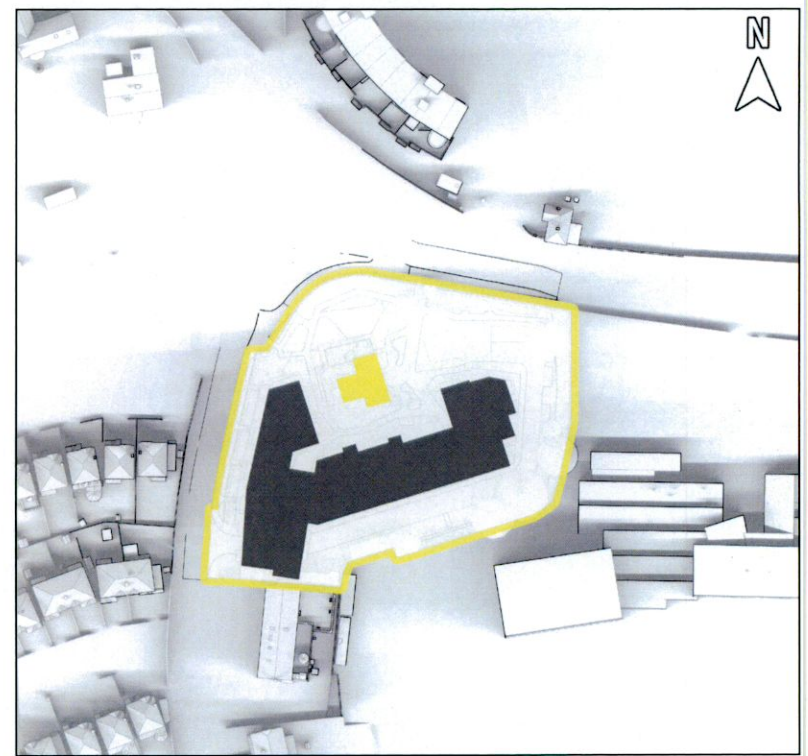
Floor plan of assessed building, Keyplan highlighting the assessed building (L).
